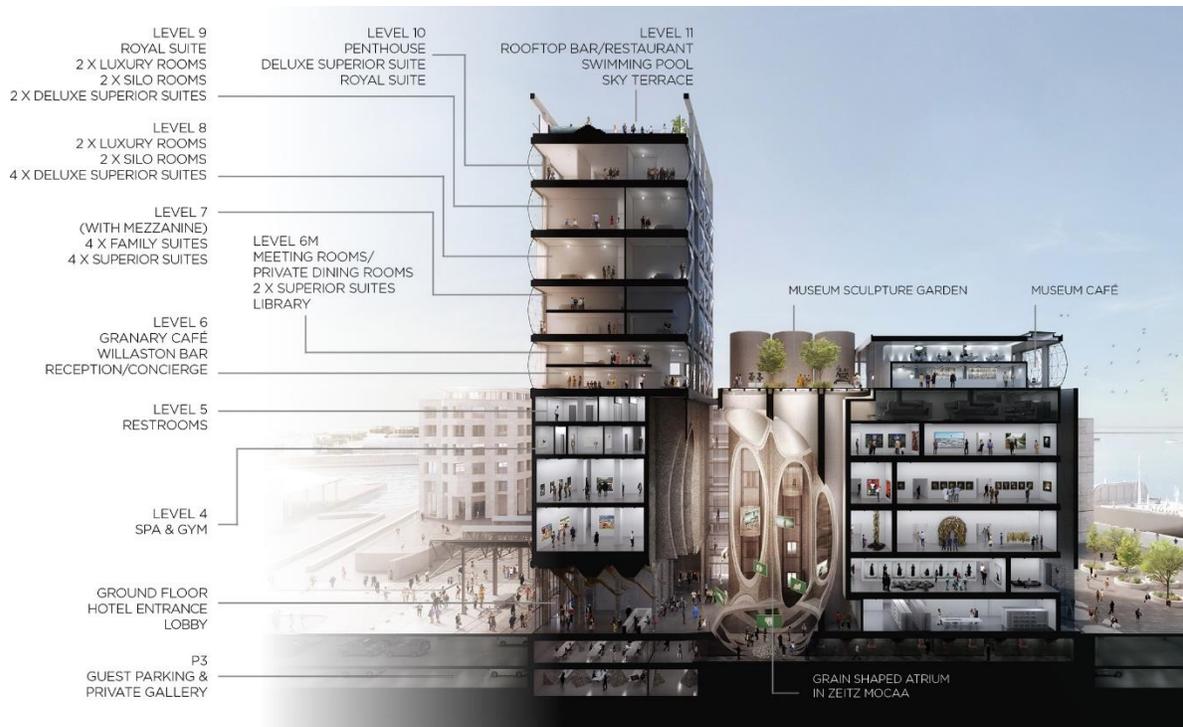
illustrating the section through the regenerated Silo building (Source: <https://www.theroyalportfolio.com>)
